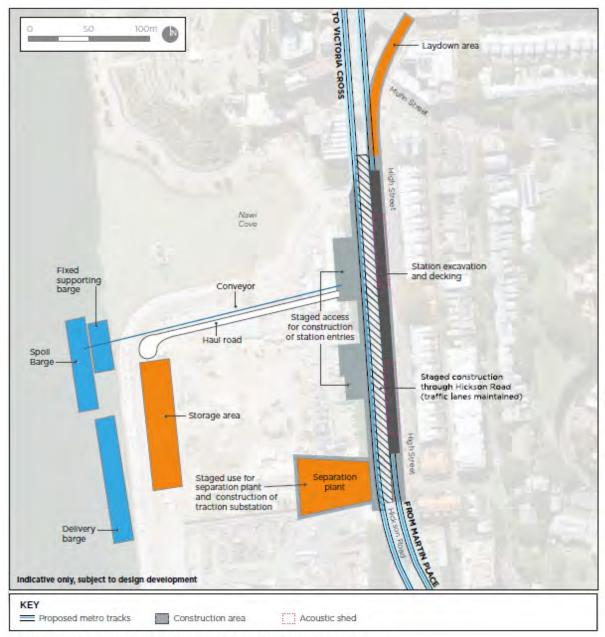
Barangaroo Station - location and layout of barging infrastructure
